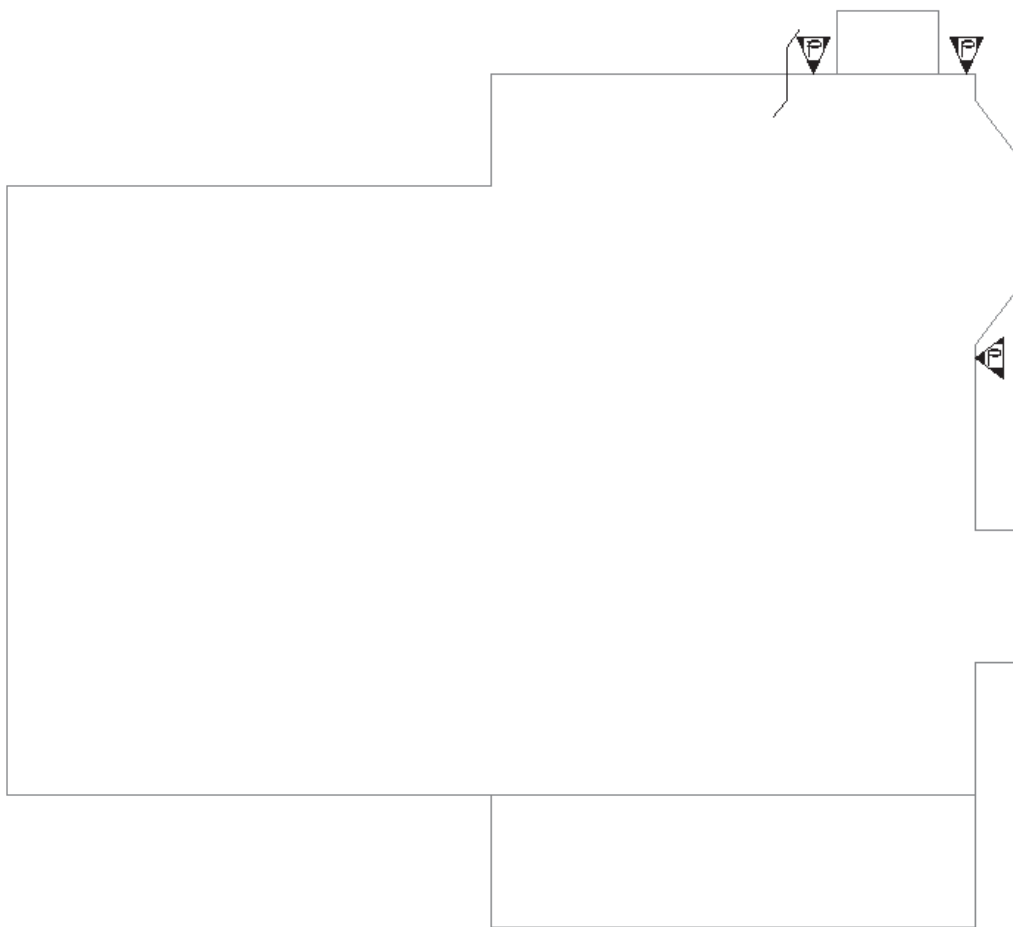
Roof gutter downspouts installed for discharge at the foundation
